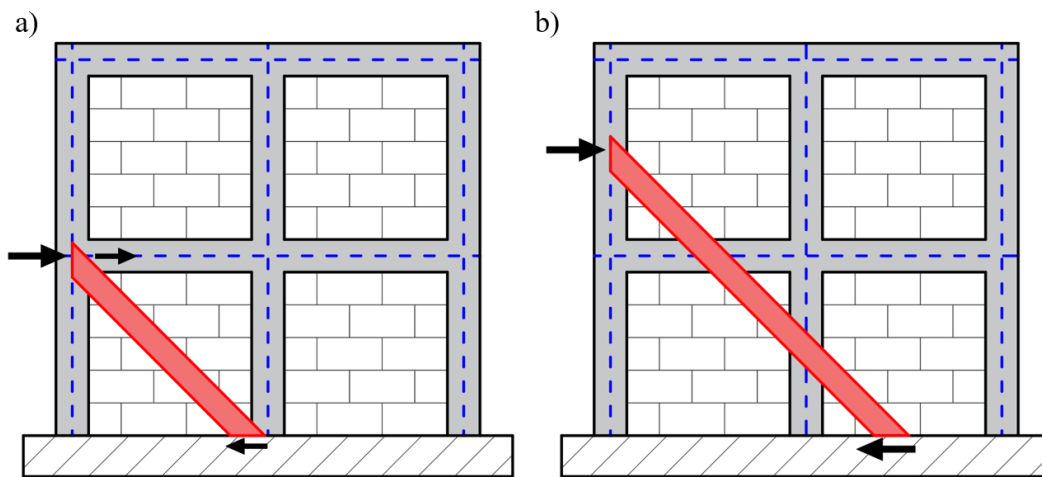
Edge Struts (a) Intersects Bond Beam (b) Does Not Intersect Bond Beam
